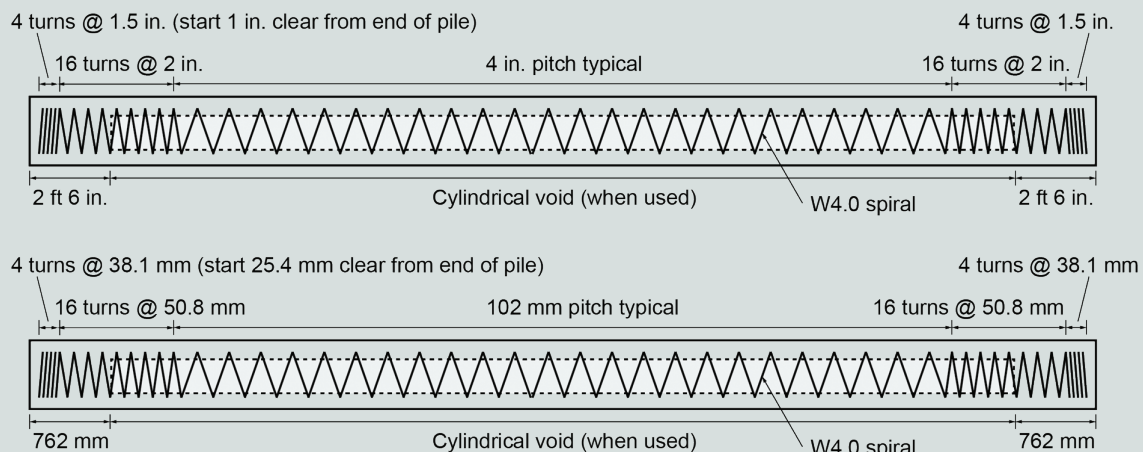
Spiral transverse reinforcement for piles greater than 24 in. (610 mm) in width or diameter.
